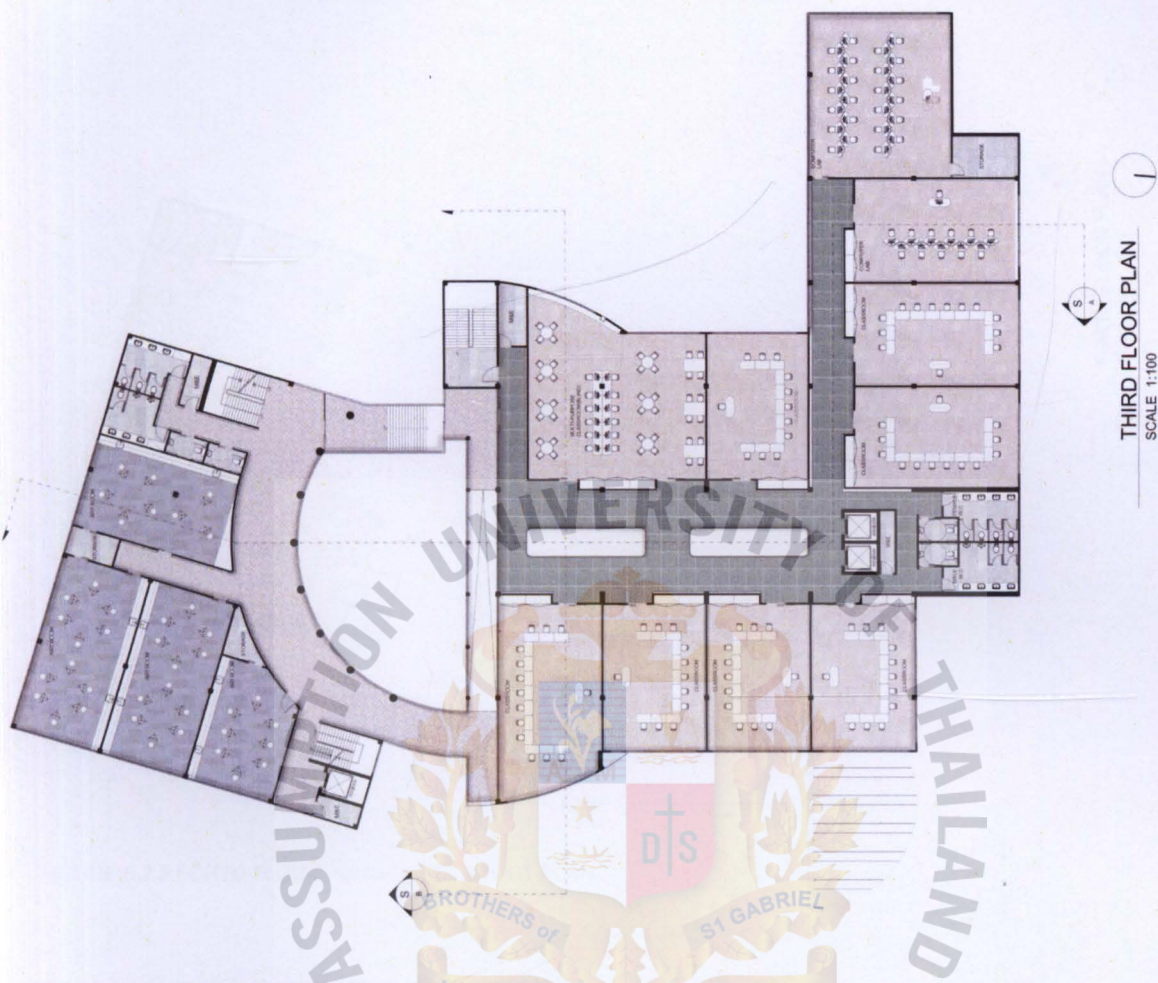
THIRD FLOOR FURNITURE LAYOUT PLAN
